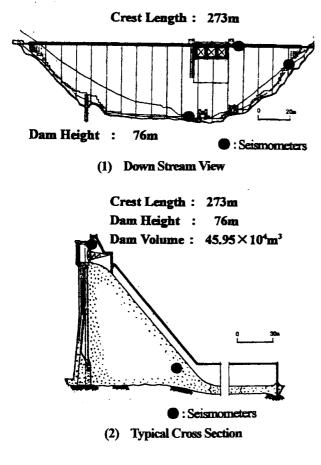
Shape of Existing Concrete Gravity Dam and Arrangement of Seismometer
